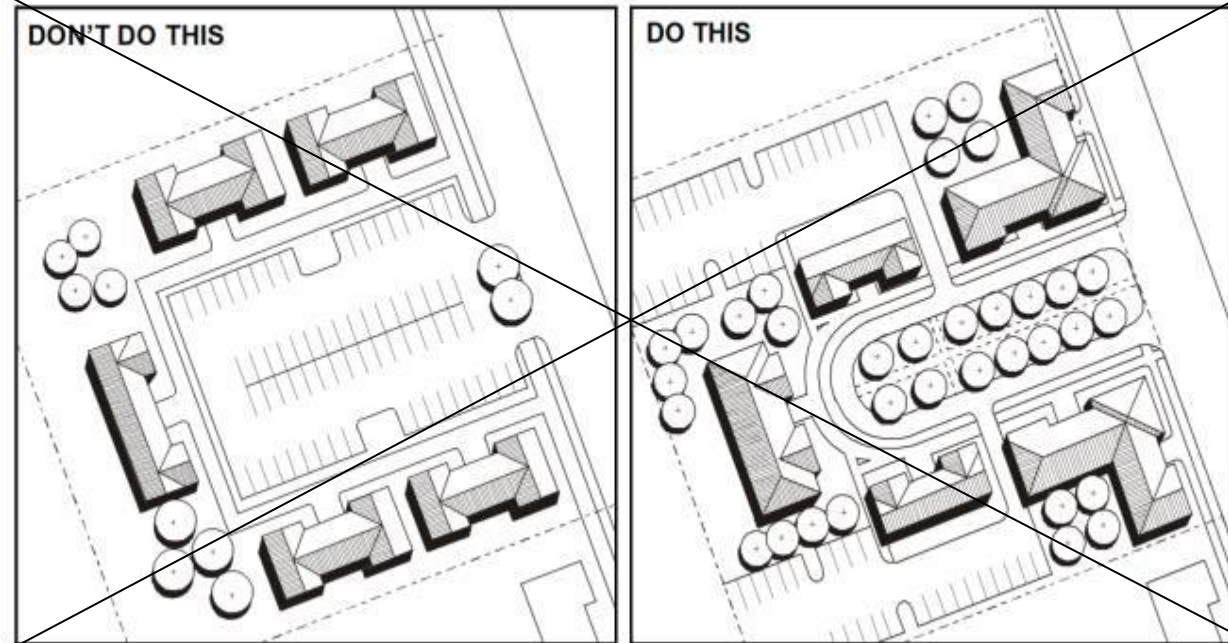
(E): Examples of breaking up parking and siting it behind buildings. Such development creates an attractive open space and avoids the impact of a large central parking lot.
